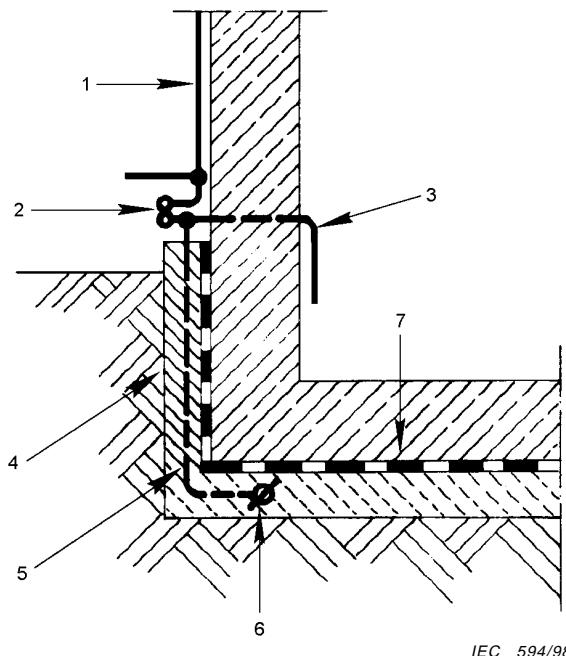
Isolated foundation with foundation earth electrode in the non reinforced concrete layer below the bitumen insulation
